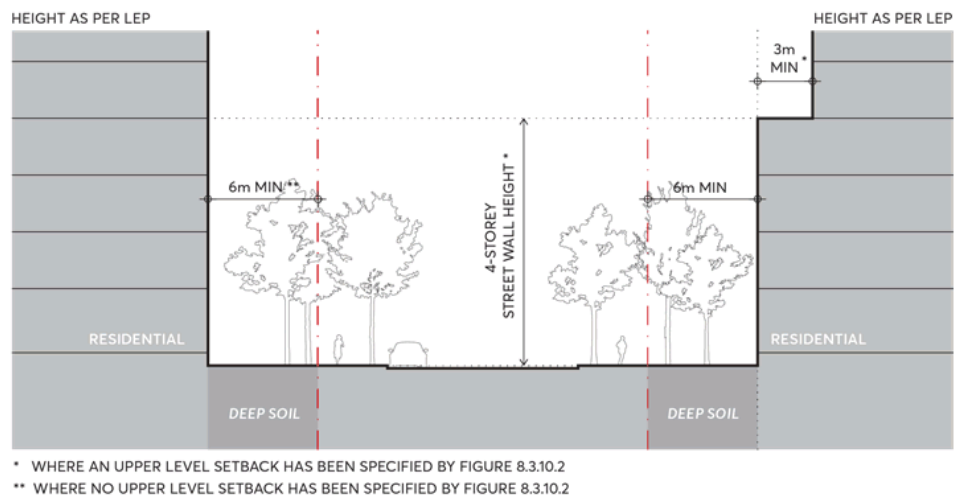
Street setbacks and street wall height for sites with a 40m height limit
